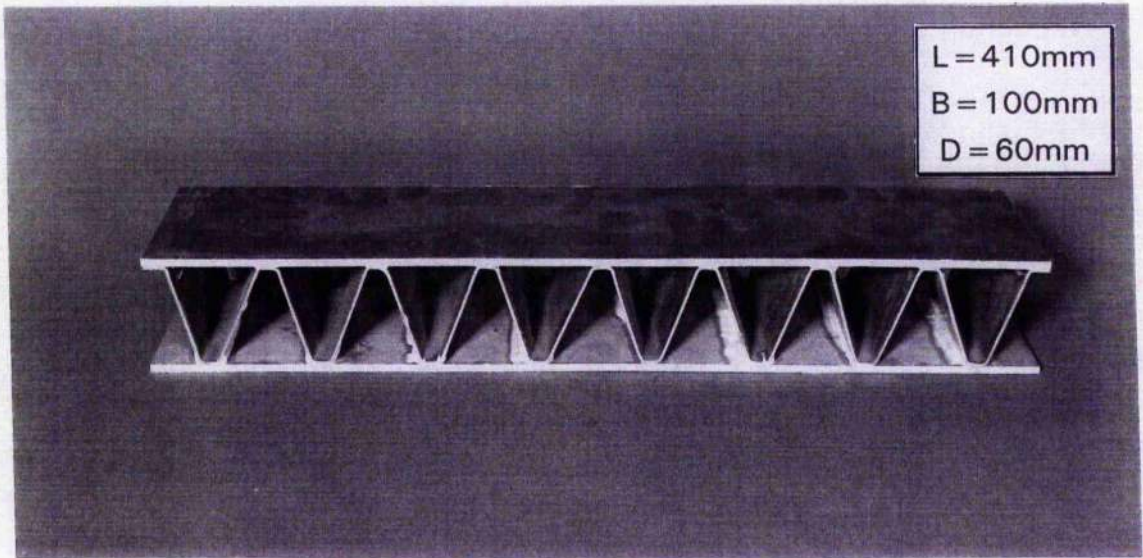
All steel adhesively bonded (Araldite 2007) corrugated core sandwich beam
